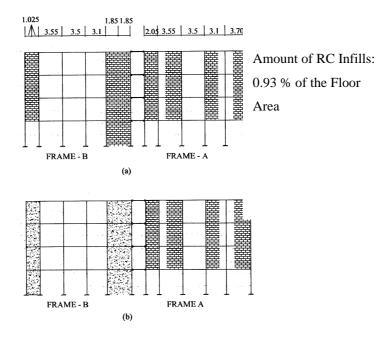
Modeling of (a) Original (b) Strengthened Structure
